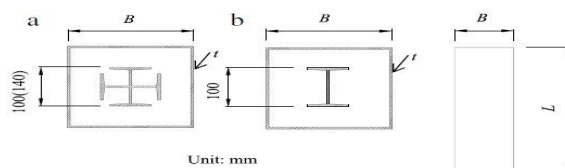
Test specimens: (a) Cross section of cross section steel profile (b) Cross section of steel profile with I cross section[36]
